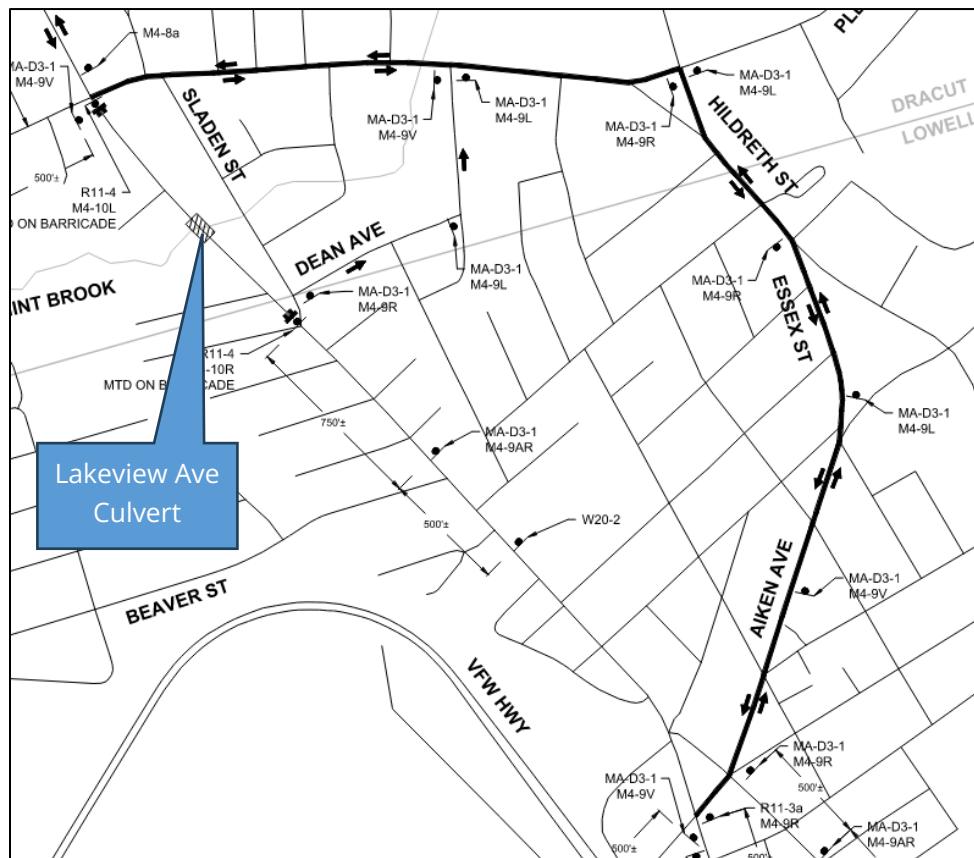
Lakeview Avenue Culvert Project Detour Plan Excerpt
